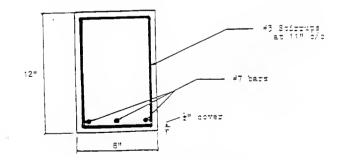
An Arbitrary Section with Reinforcing Bar Arrangement Near Mid-span for Shear Specimen II (SS2B) (1 in. = 25.4 mm)
